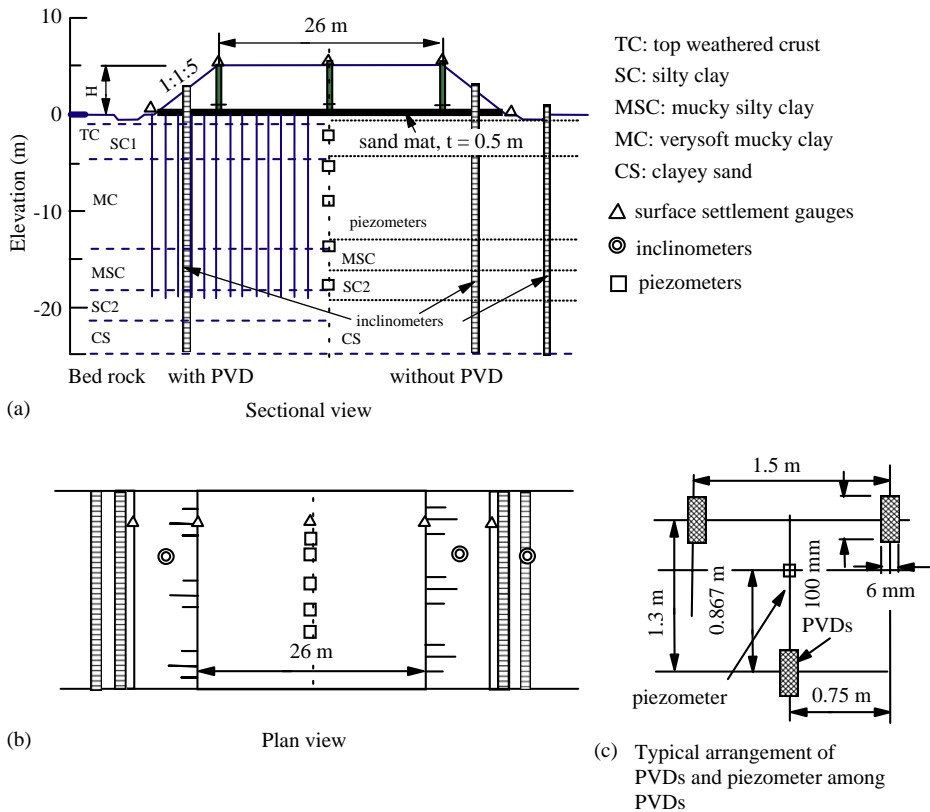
Cross-section and plan view of embankment, field instrumentation, and arrangement of PVDs in field.
